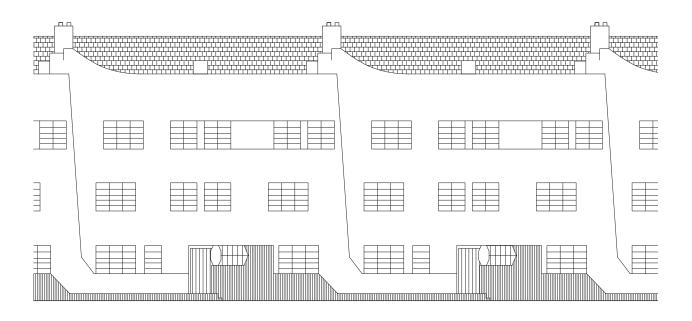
Facade of the building along Pieter Lodewijk Takstraat 1:200
